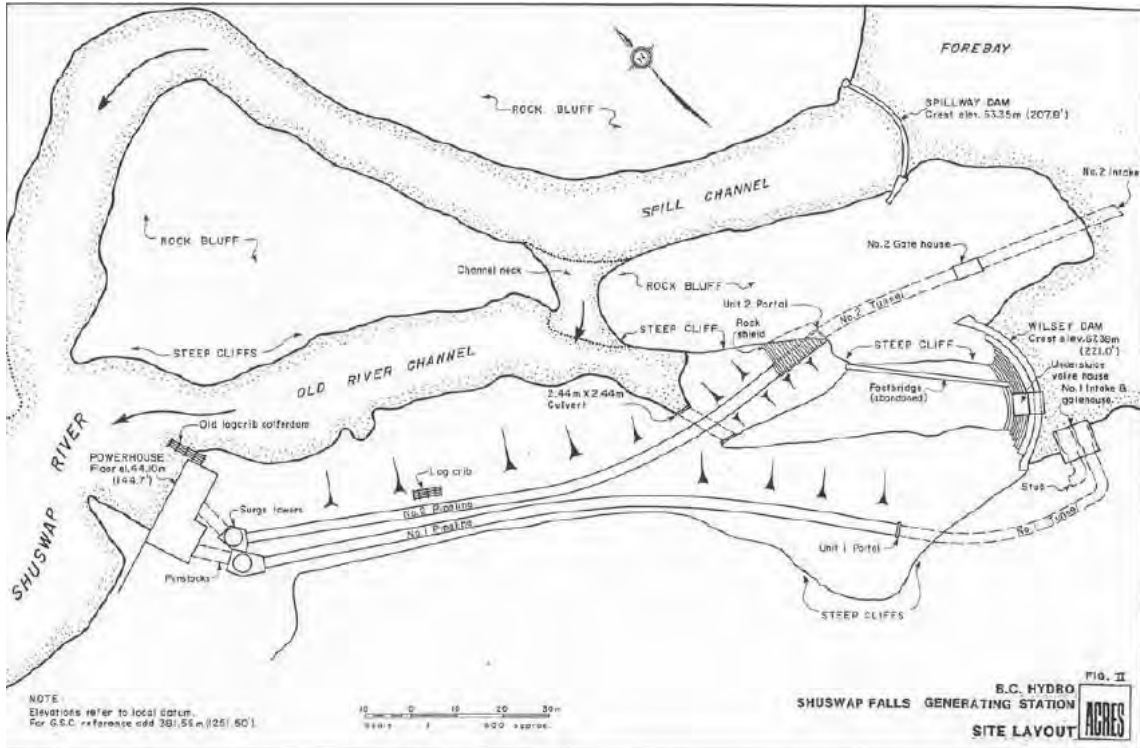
Wilsey Dam facility layout (NHC and Ecofish, 2002).
